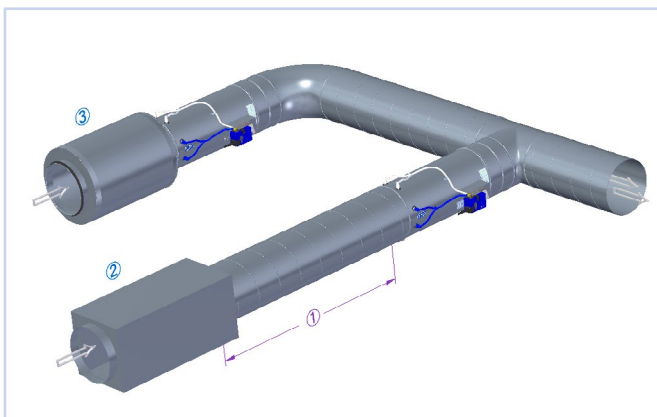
Installation extract air ① Recommended min. 5 x Dia. ② Silencer with construction. ③ Silencer without construction.
